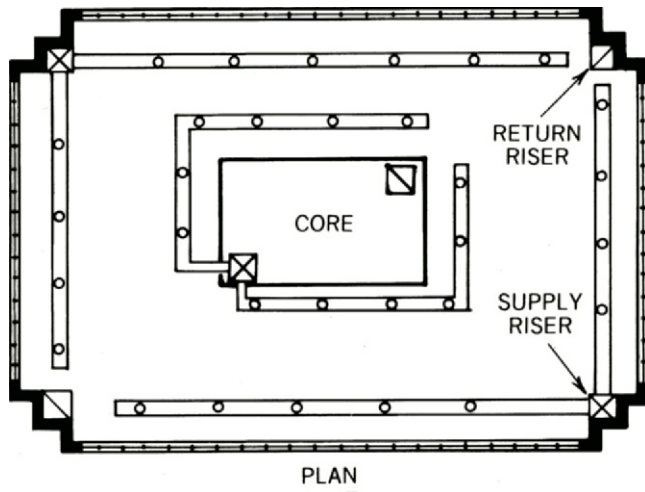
One way to minimize floor-to-floor height is to supply the perimeter zones with separate perimeter risers. These ducts can be expressed on the facade.
